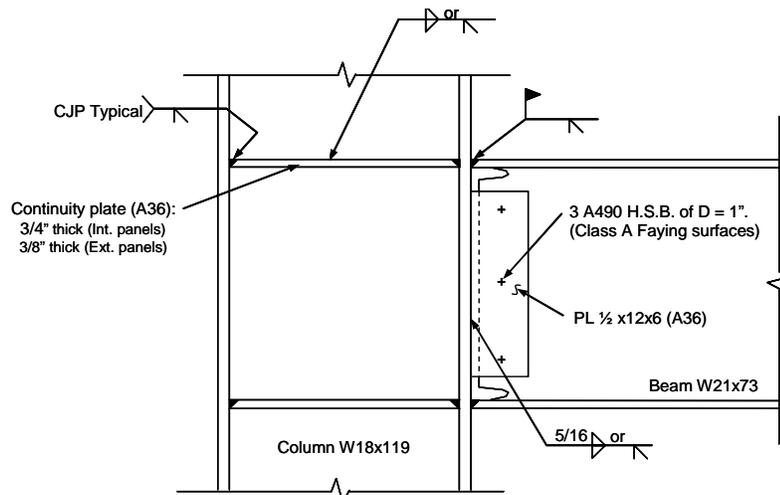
WUF-B Connection Details – Second Floor of Building in SDC C zone
